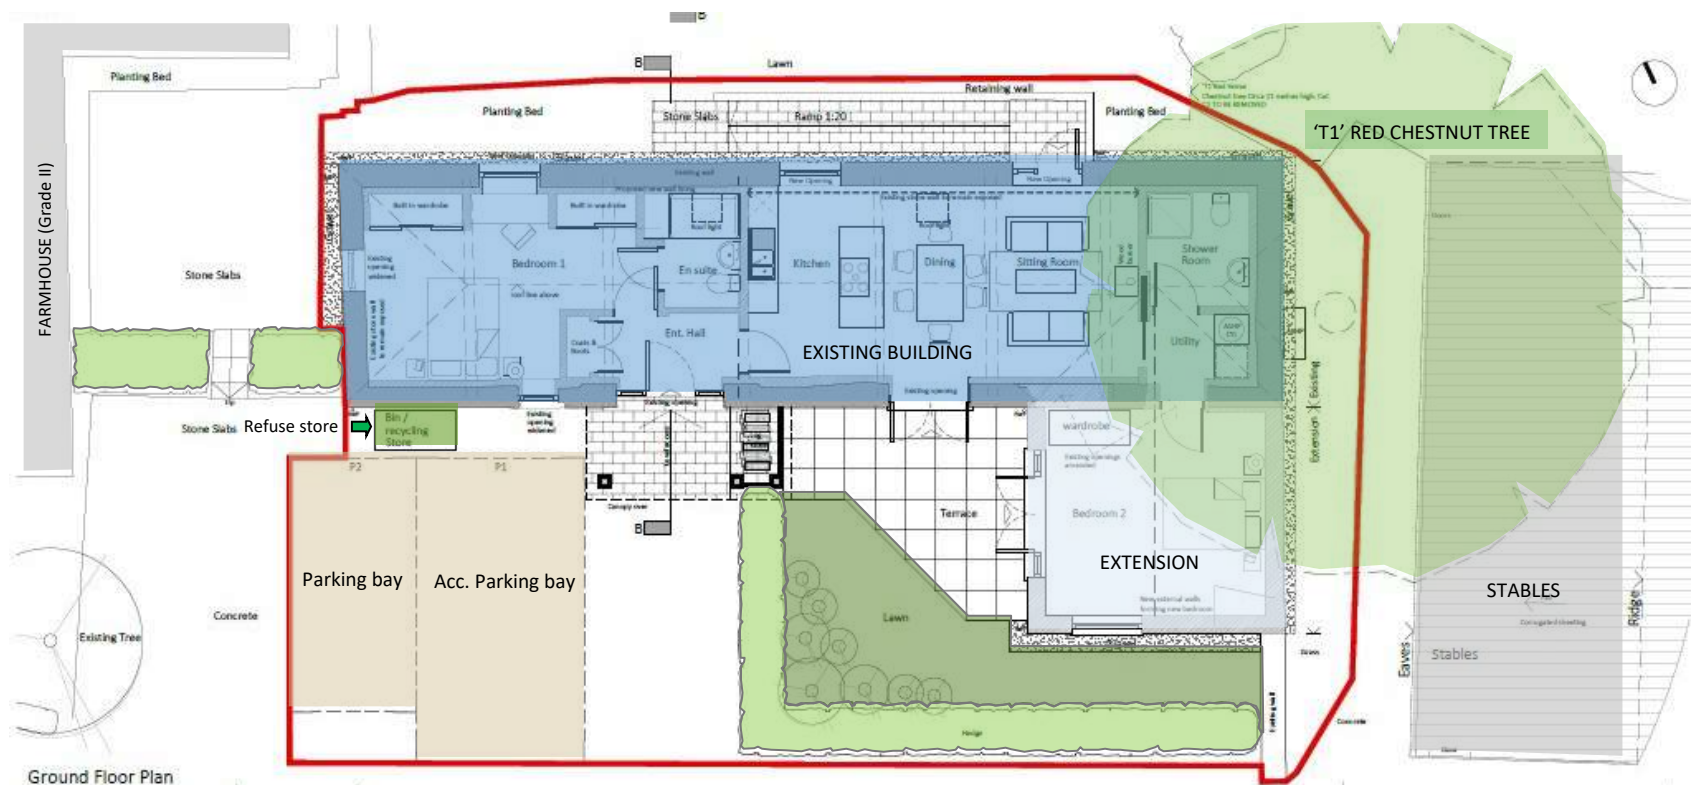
PROPOSED GROUND FLOOR PLAN, (NTS)
